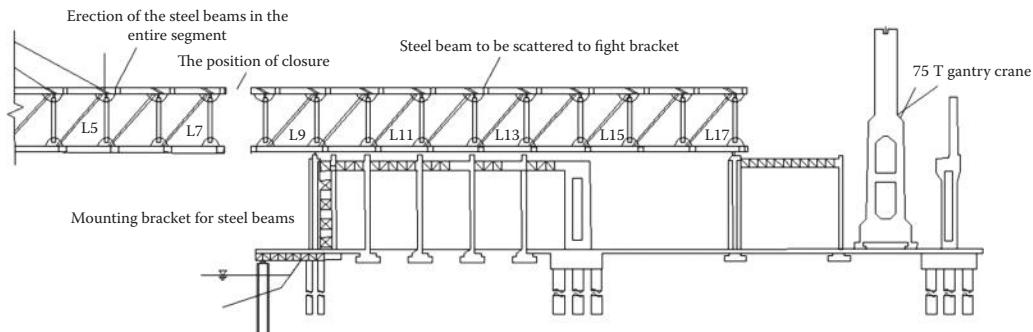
Steel truss girder erection on riverbank. (From Hu, H.Z., *Bridge Constr.*, 3, 1–4, 2007.)
